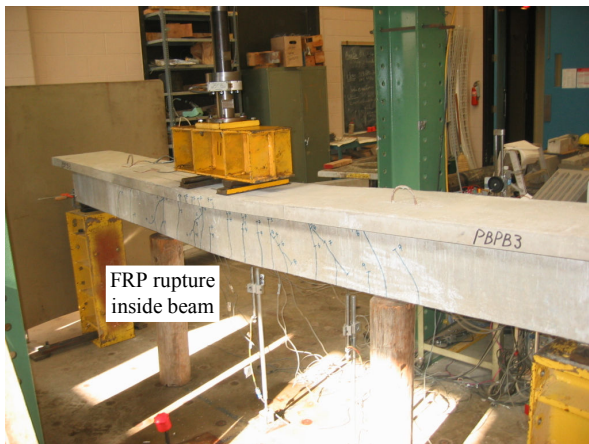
Failure modes of NSM strengthened beams (Group II)
